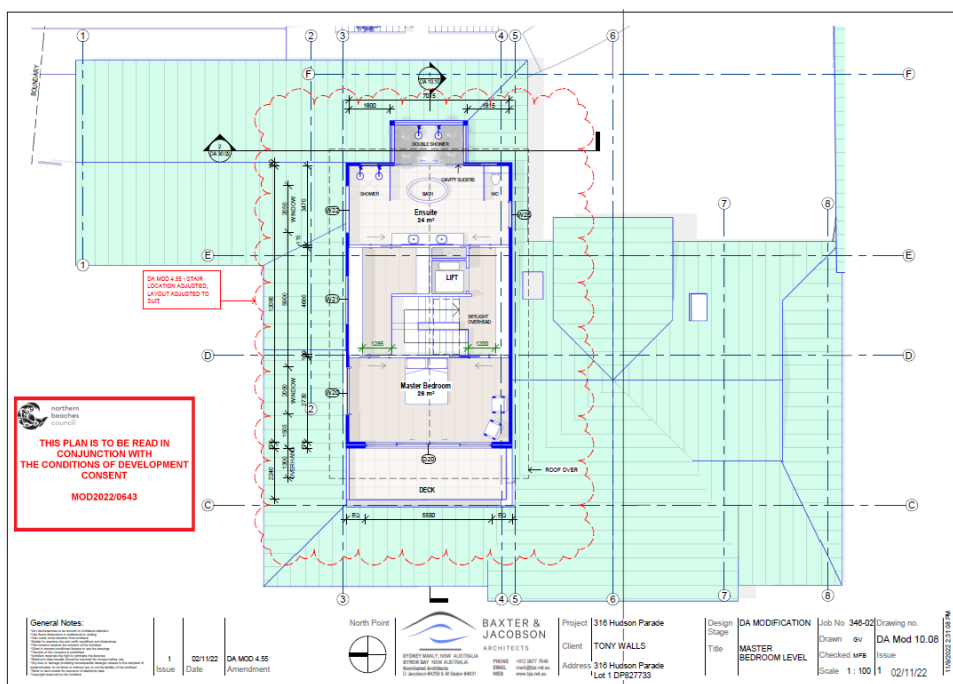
Plan Extract: Modified Master Bedroom Level Plan.
